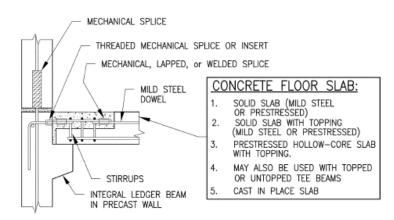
End detail of a monolithic connection between precast concrete floor element and a precast concrete wall.
